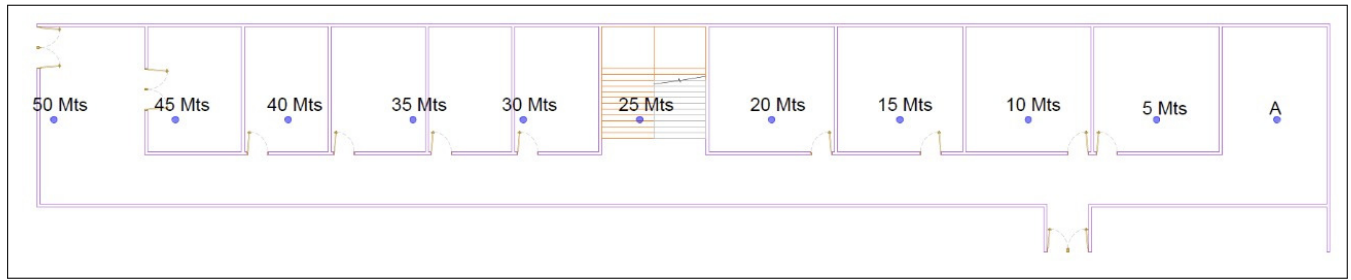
Layout of the building where the experiments with obstacles were conducted. A single floor of the building was used, with 12 adjacent spaces or rooms separated by brick walls. One device was placed at point A, and transmission tests were conducted with a second device in the other rooms, at the locations indicated by the other points.
